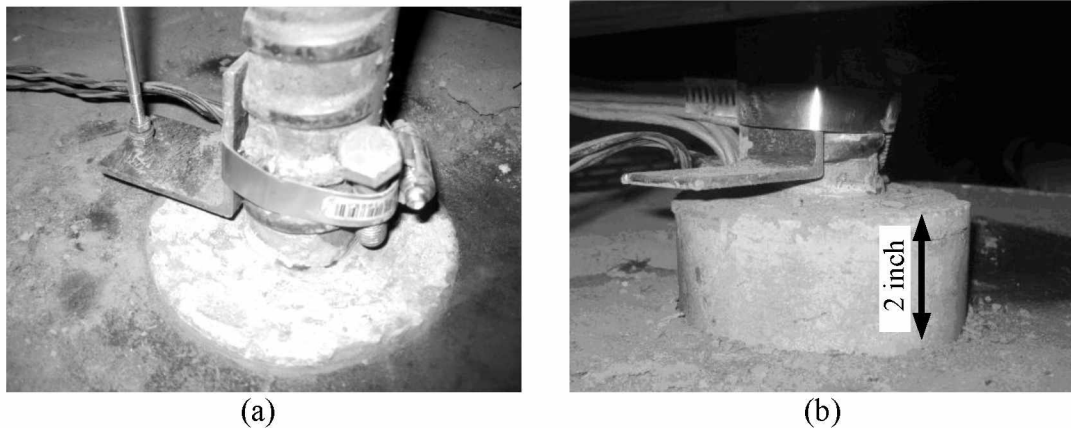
Pullout failure pattern. (a) anchor before loading; (b) anchor after failure.
